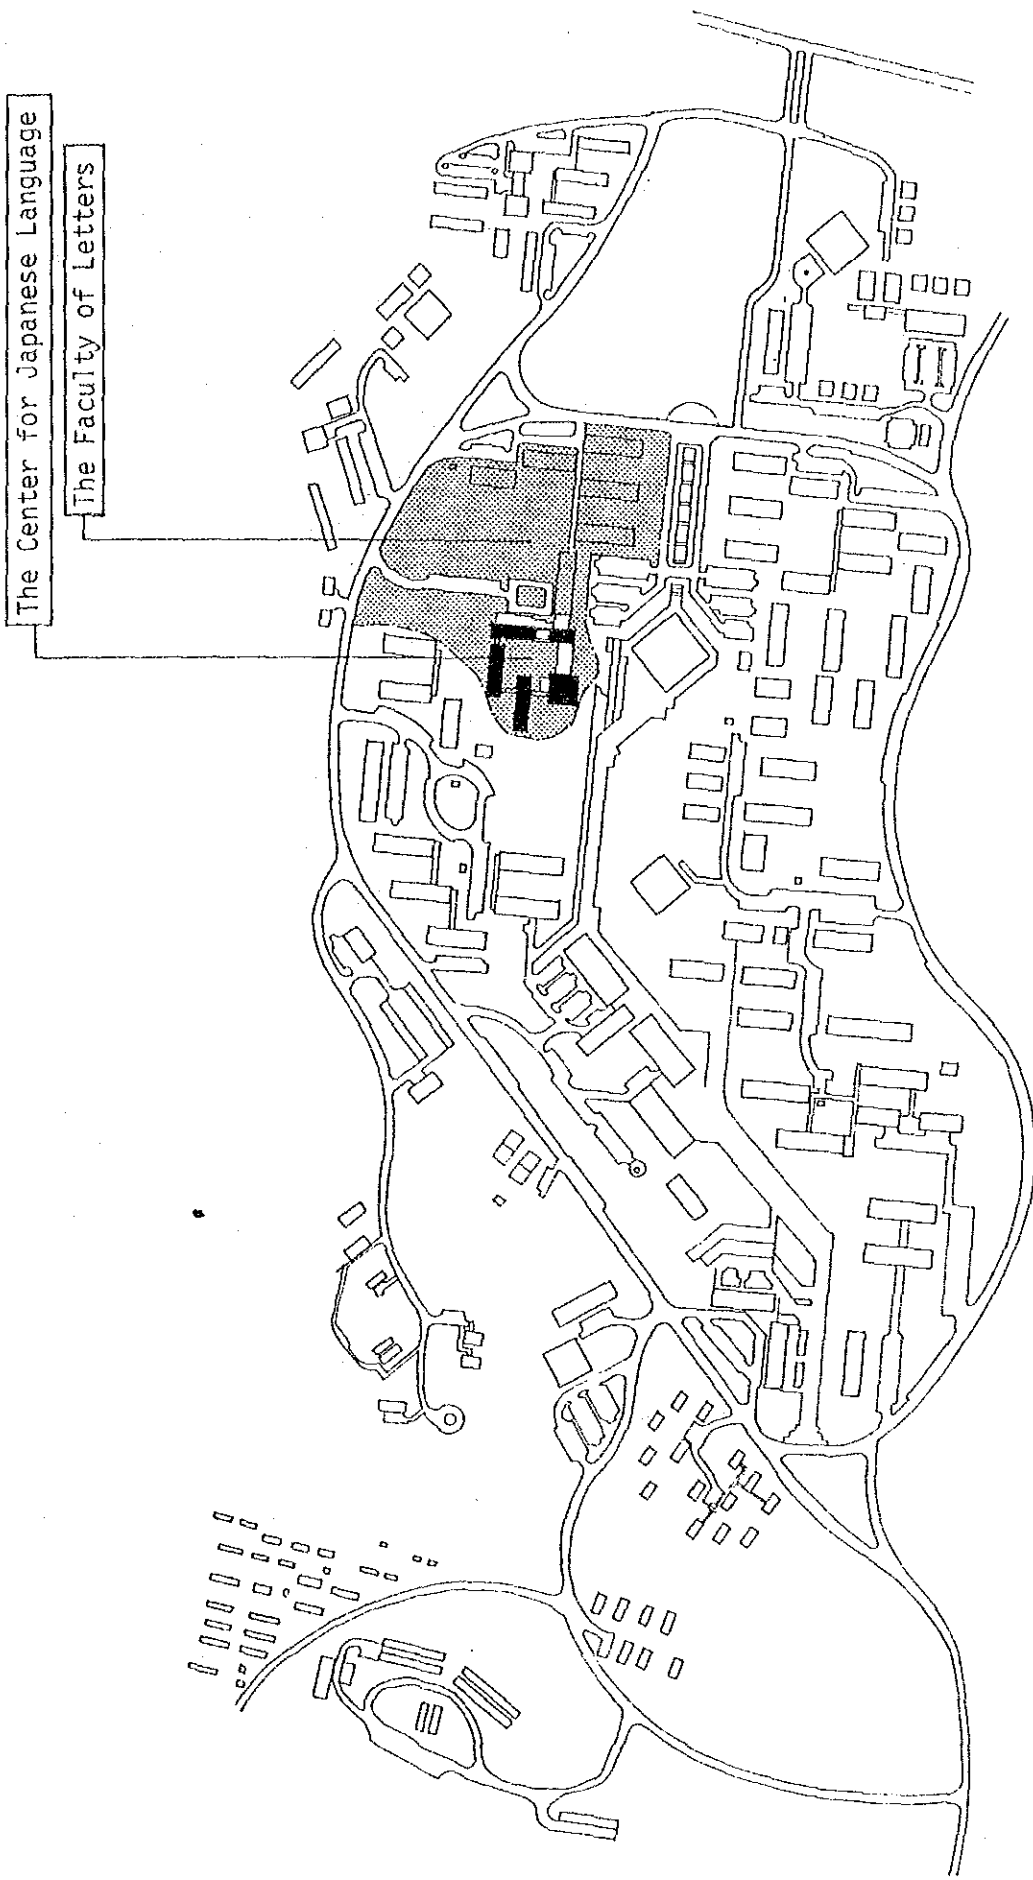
Padjadjaran Univ. Campus at Jatimangor Site Plan
